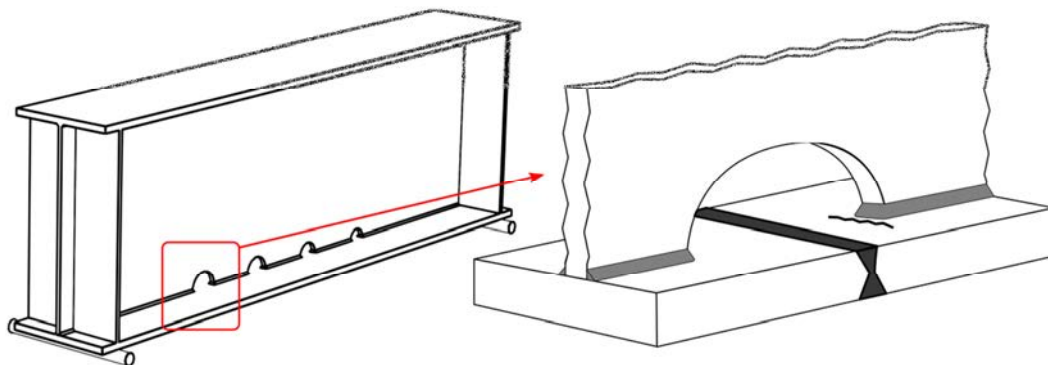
Welded detail with cope hole and fatigue crack location
